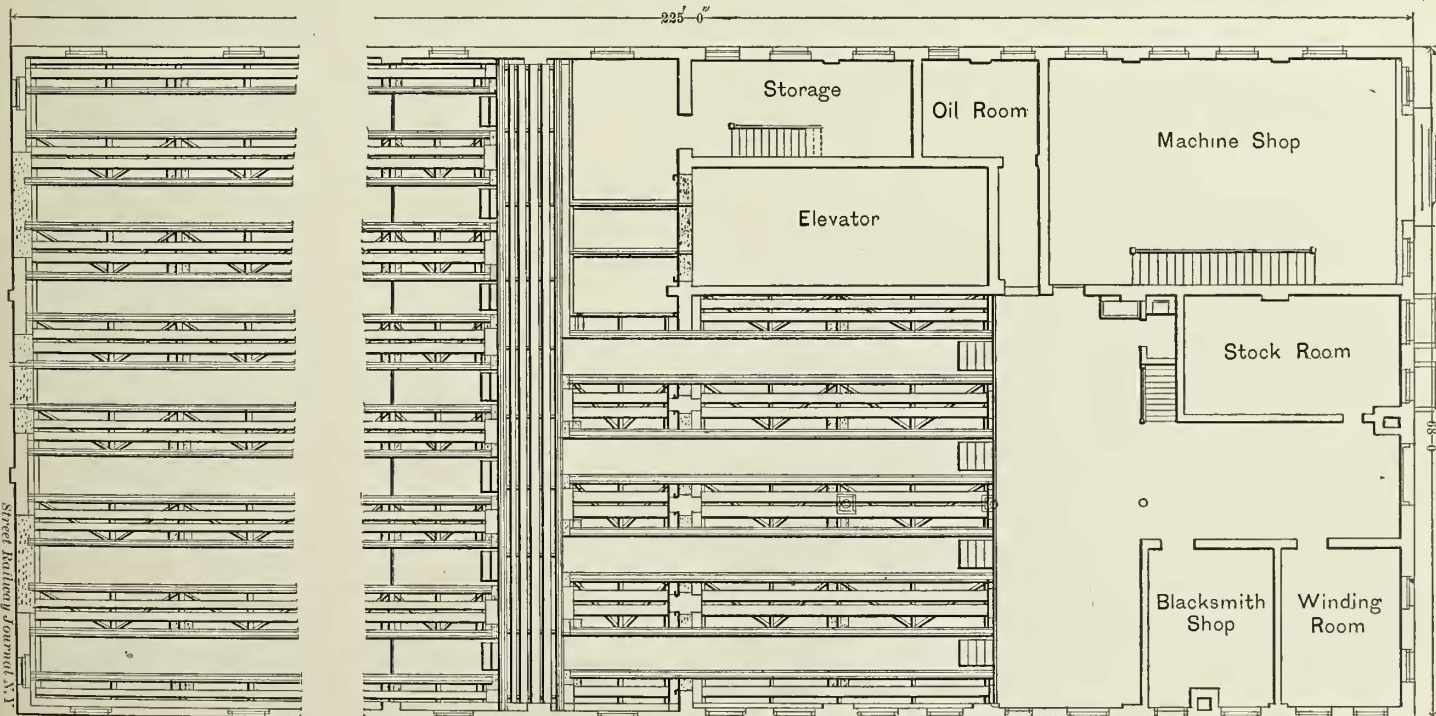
PLAN OF GROUND FLOOR OF CAR HOUSE—PEOPLE'S STREET RAILWAY.
